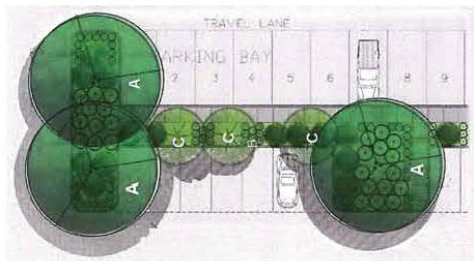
Example of Parking Lot Planter Areas.
